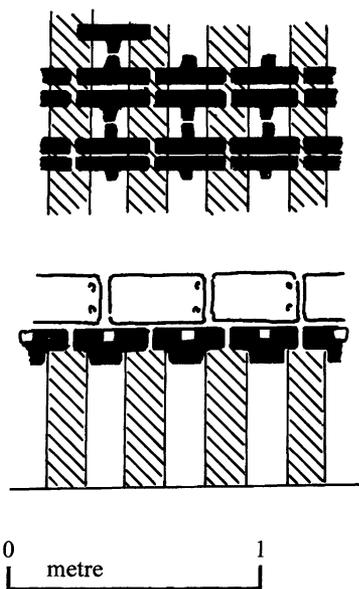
Borelli Yard, Farnham. Diagram showing in plan and section the possible arrangement of the kiln bars (shown in fig 18a) in the kiln.
